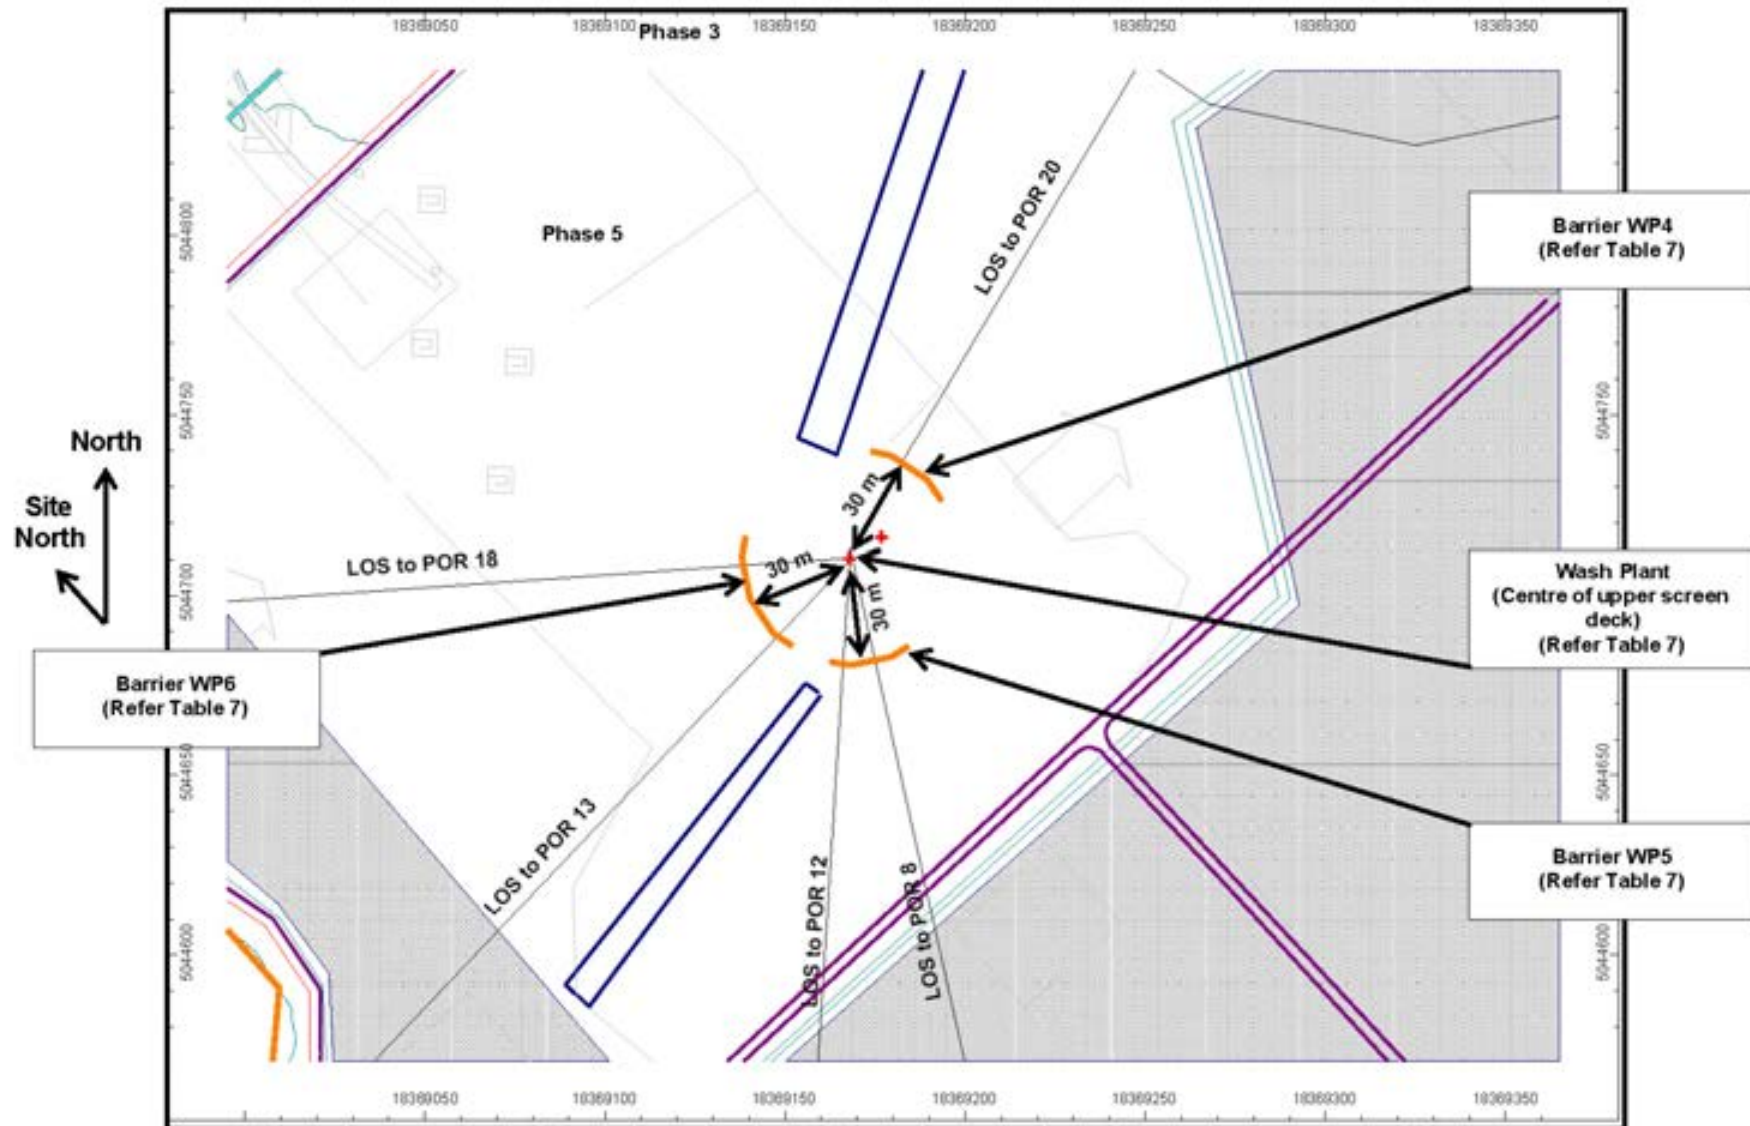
Detailed Plan at Wash Plant in Phase 5 showing Recommended Noise Barriers (Stockpiles)
